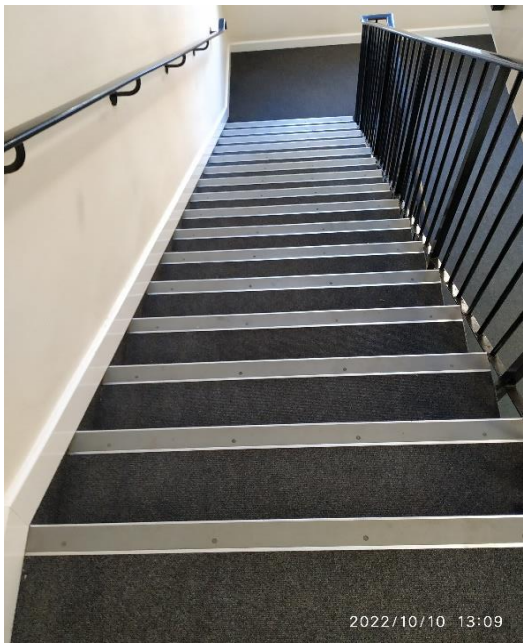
Observation - Stair treads and risers were found to be in good order.
